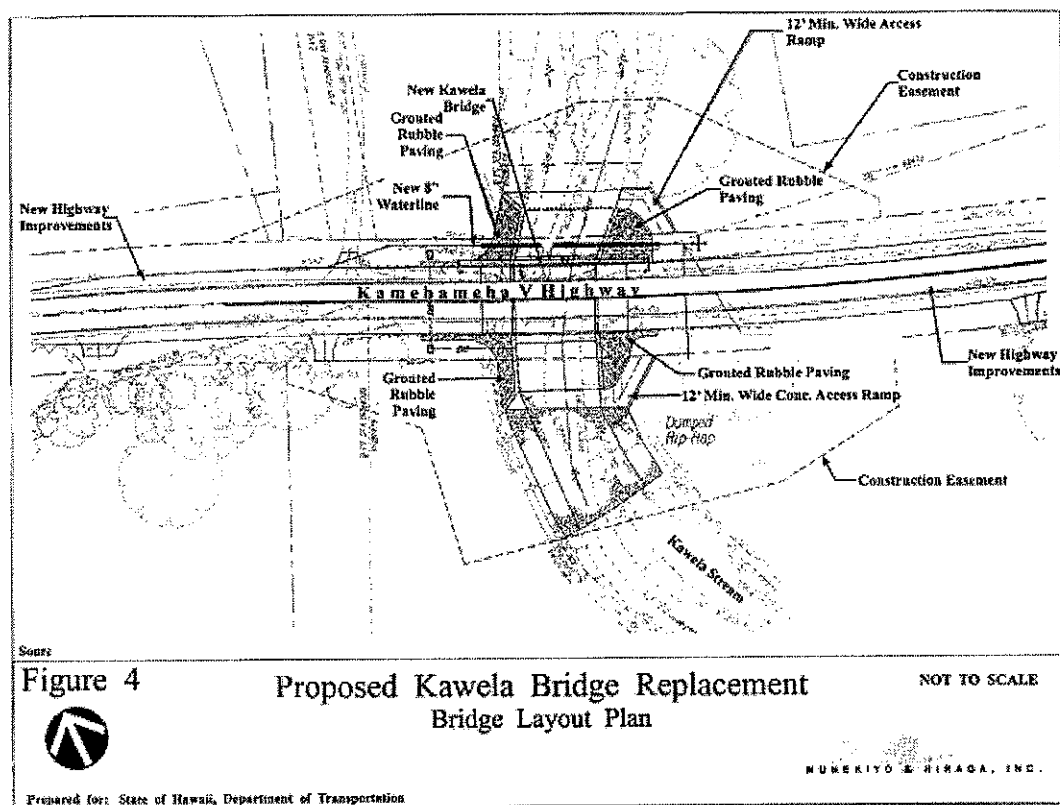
Proposed layout of new bridge (Munekiyo & Hiraga, 2009).
